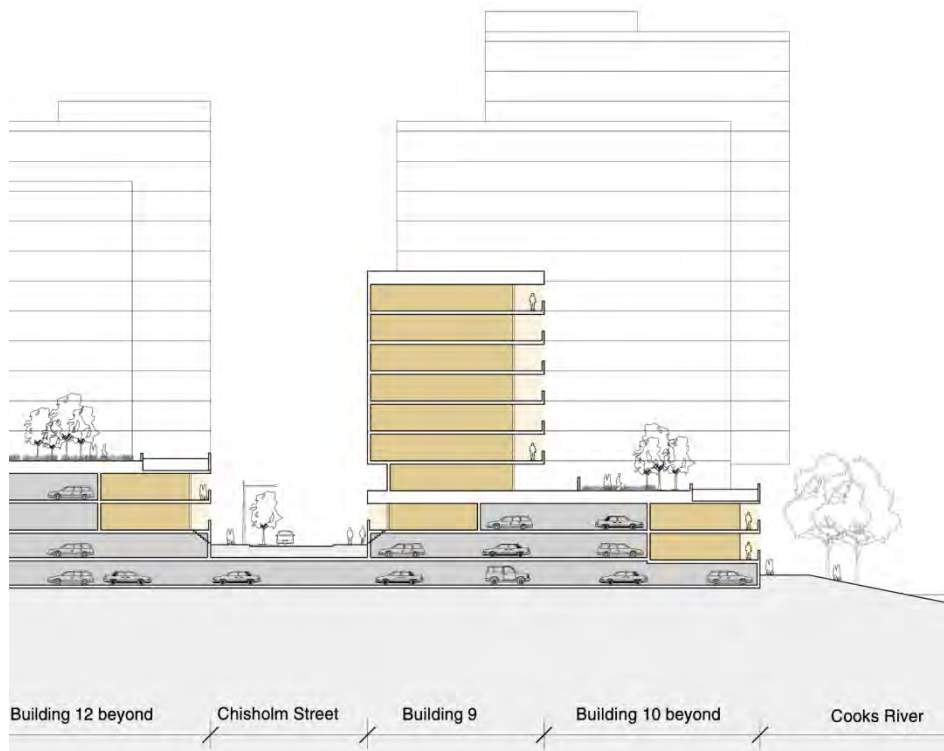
Northern section showing above ground parking is flanked by residential uses
